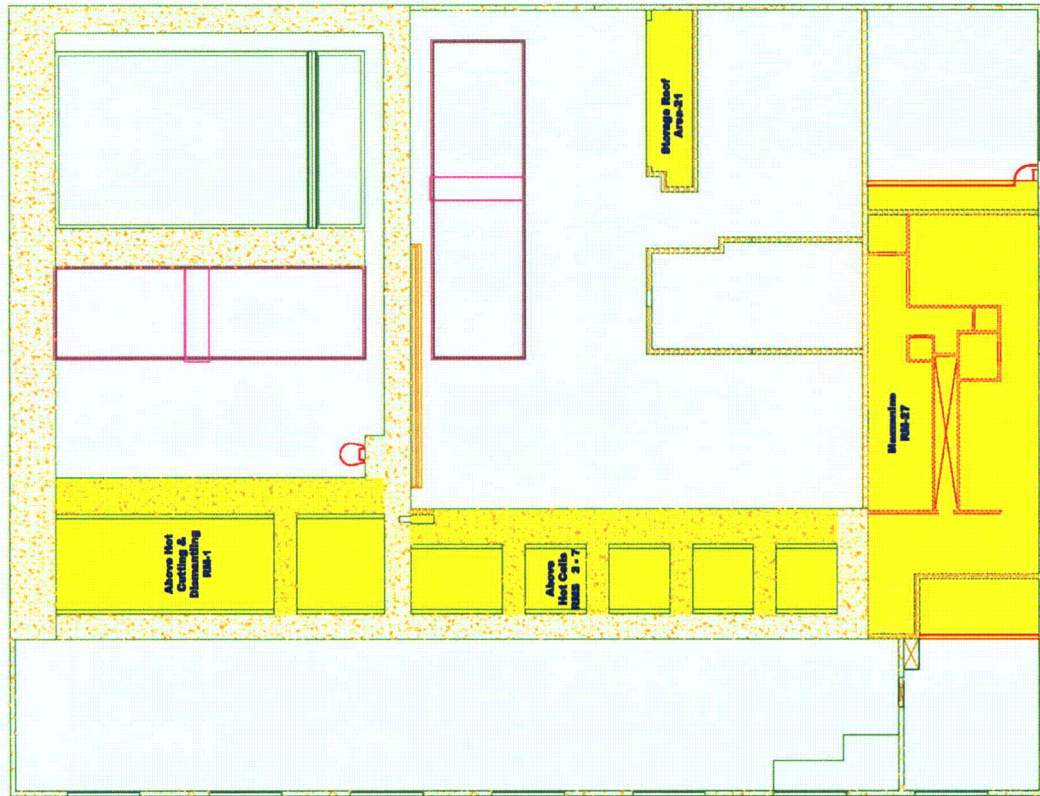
Hot Laboratory Building +11'-6" Elevation
